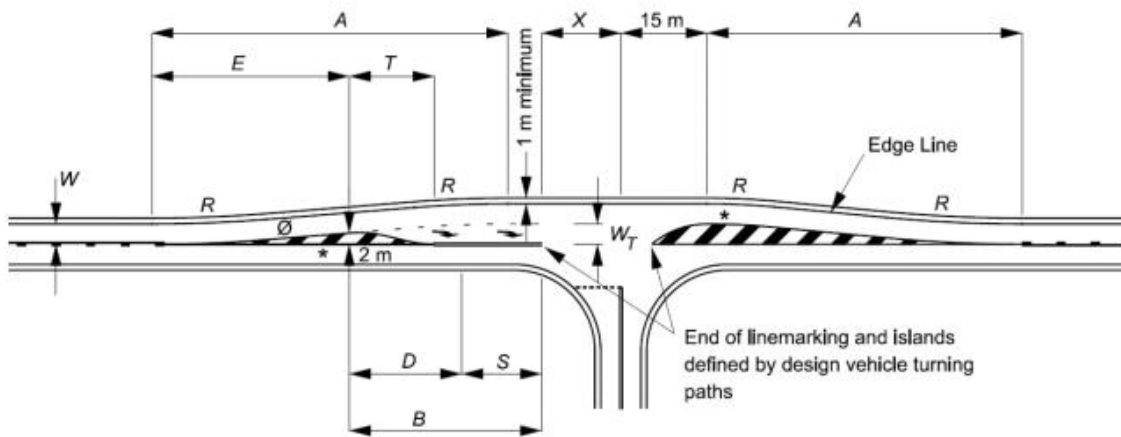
Typical Layout – BAL (Standard Drawings for Intersections and Interchanges)
